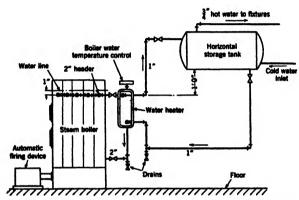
INDIRECT WATER HEATER MOUNTED ON SIDE OF BOILER
